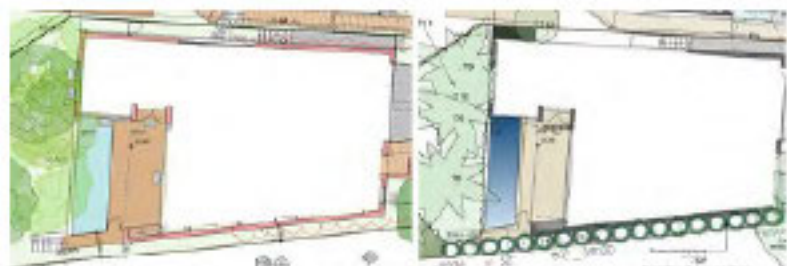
House 2 comprising a 900mm side setback for the deck/stairs (left) and Screen Planting within the 900mm side setback (right).
